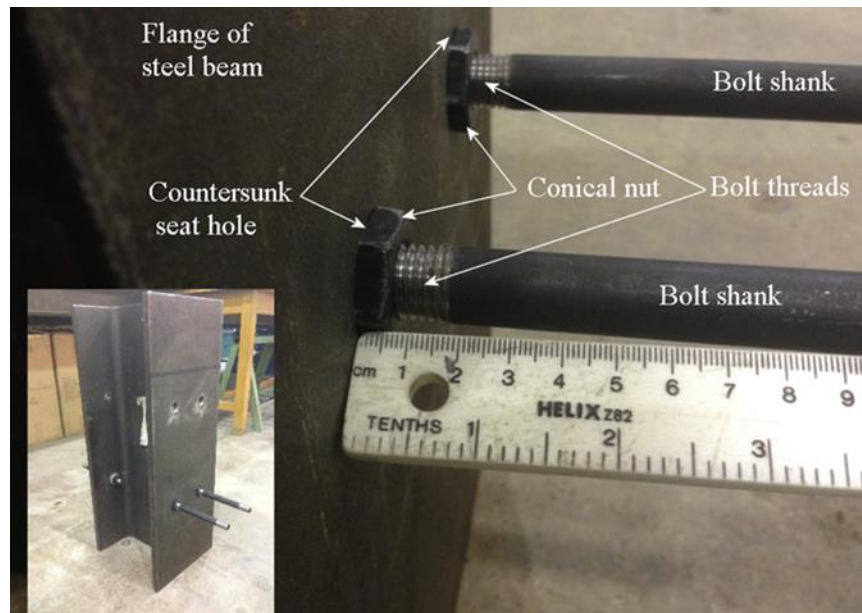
Positioning bolts over steel beam of LNSC Test 5
